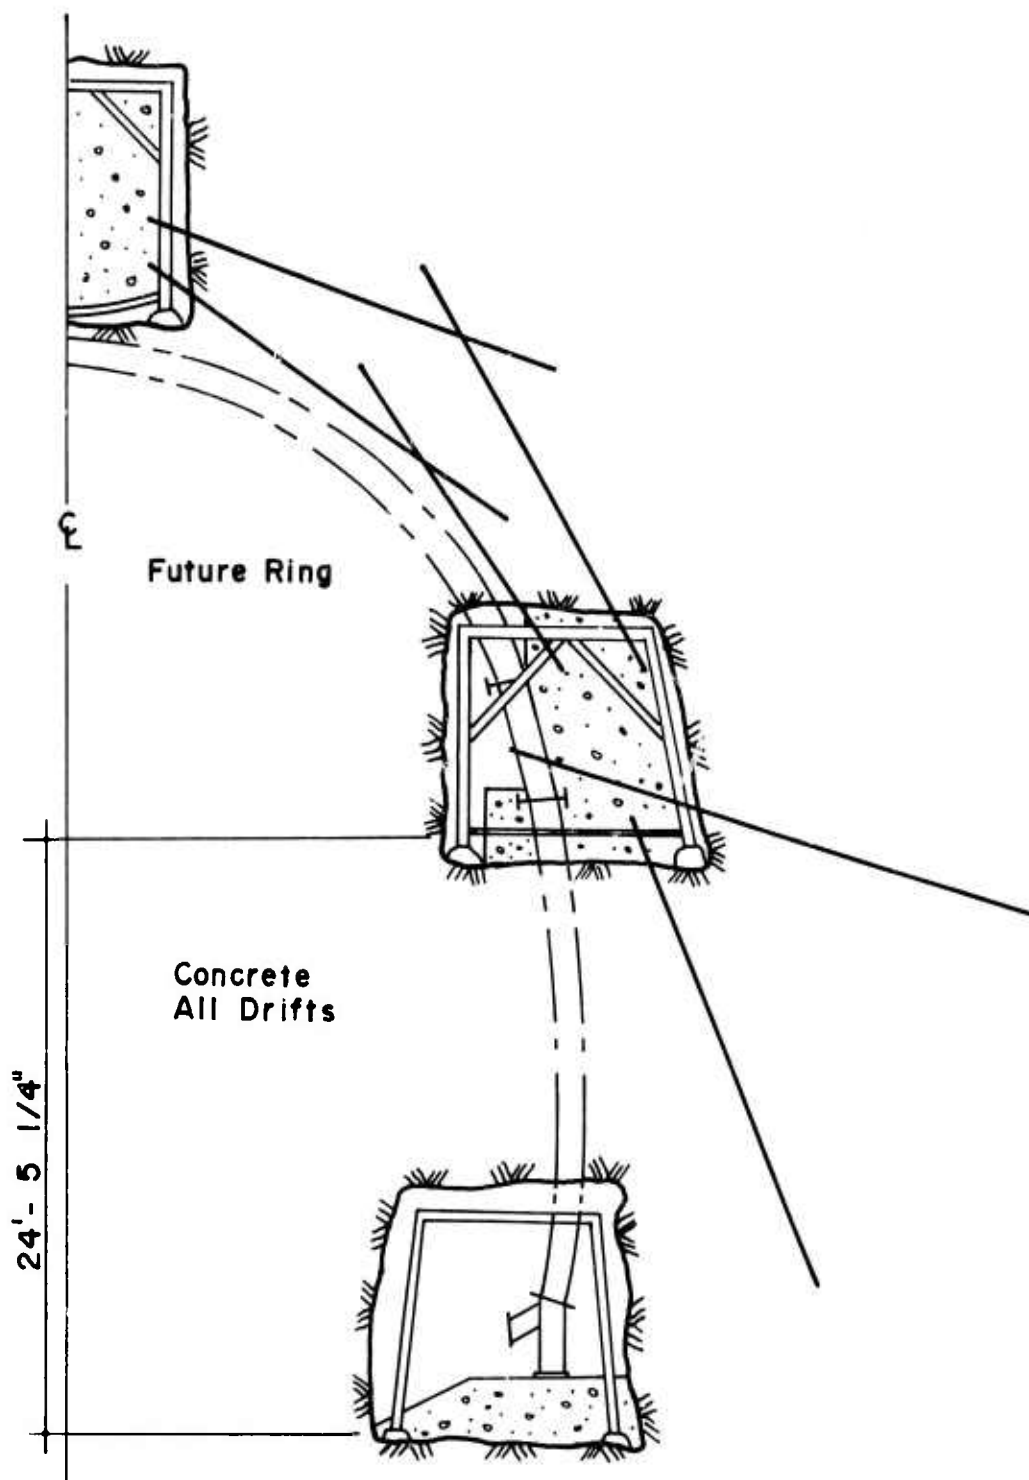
MULTIPLE DRIFT SYSTEM, STRAIGHT CREEK TUNNEL,
